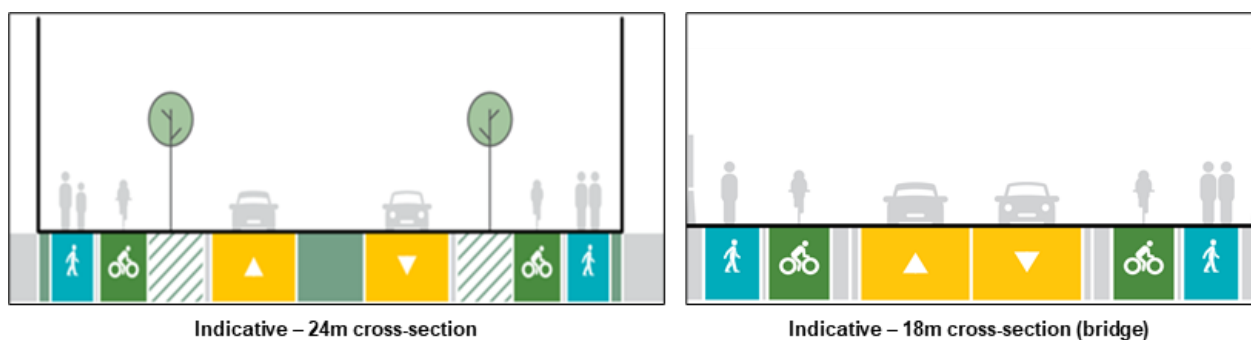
Indicative cross-sections for multi-modal corridors (Manuia Road, Taka Street, Walters Road)
